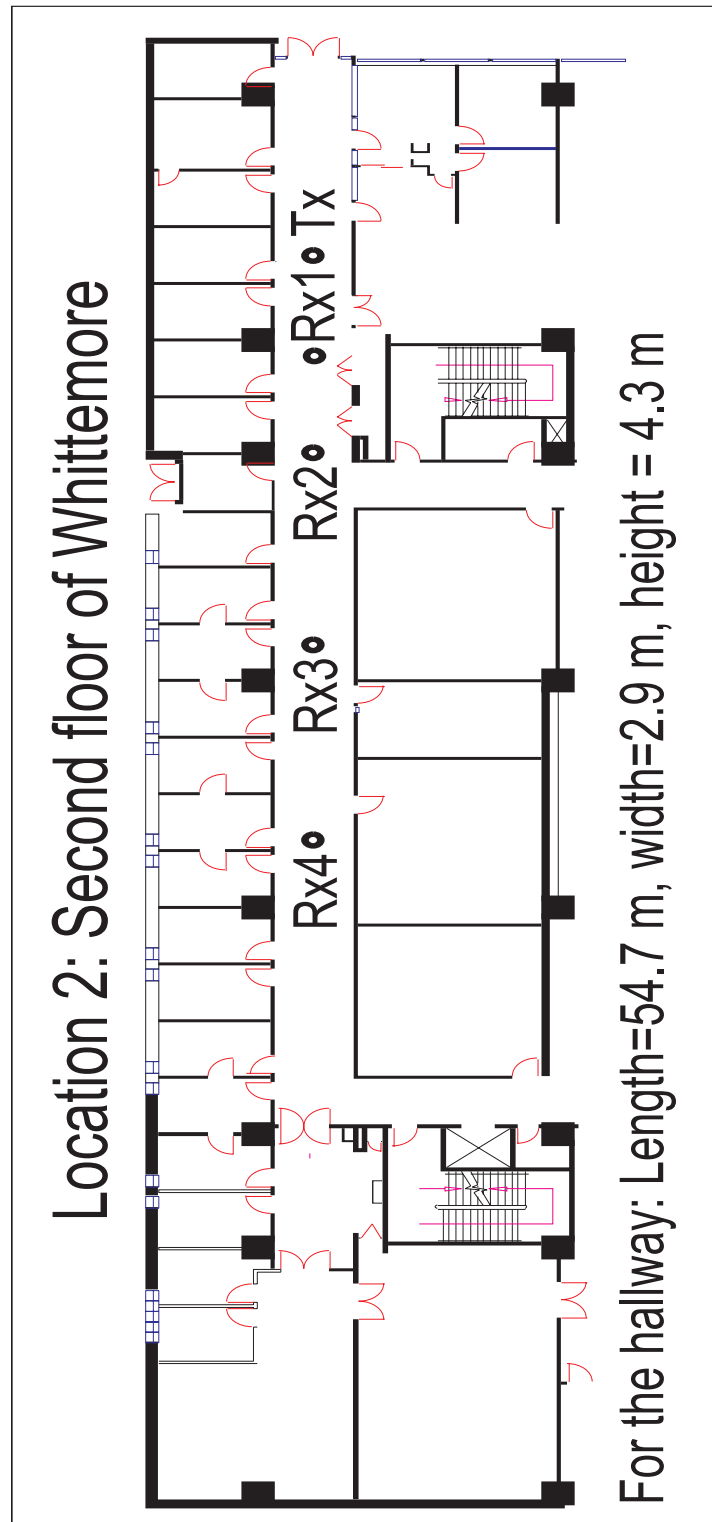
Location 2 – hallway on the second floor of Whittemore building.
